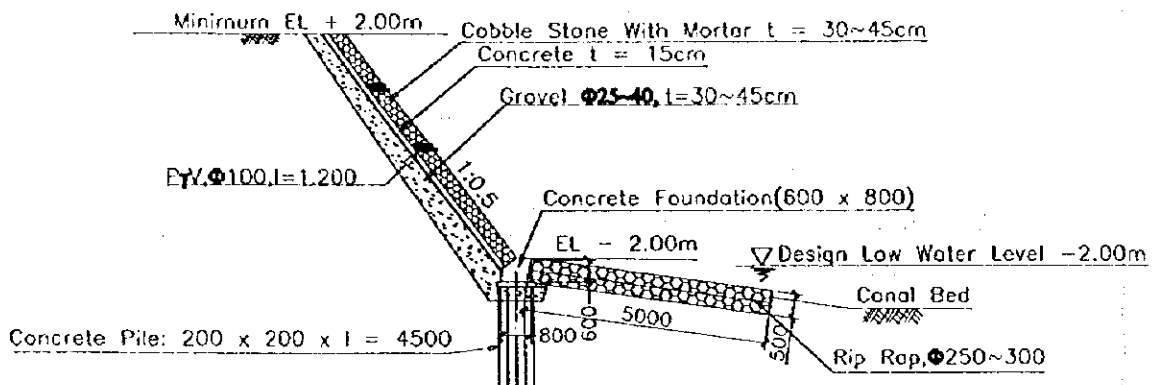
(2/2) TYPICAL DESIGN CROSS SECTION OF TAU HU - BEN NGHE CANAL IMPROVEMENT (2)
